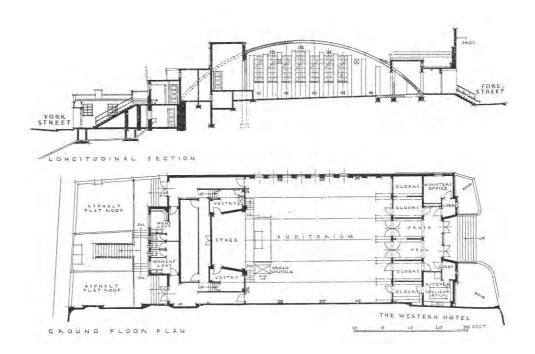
Plan and Section of Devonport Central Hall, 1951. Source: Building News, 1951.
